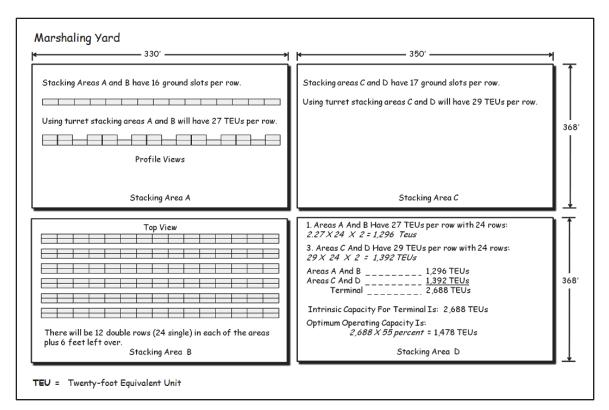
Partial layout plan for container space requirements in a marshaling yard
